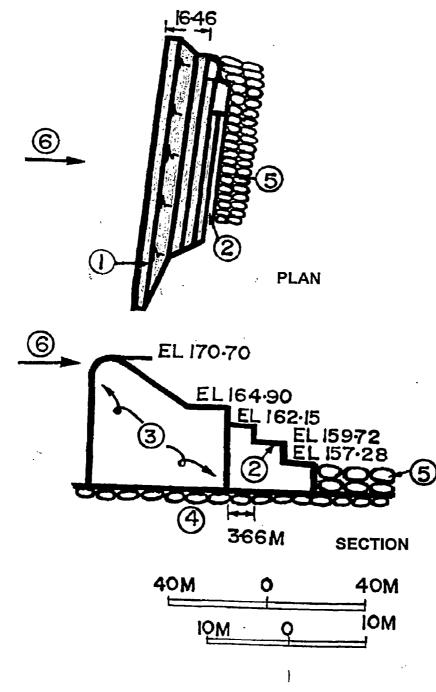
Srisailam dam – Layout of diversion works
